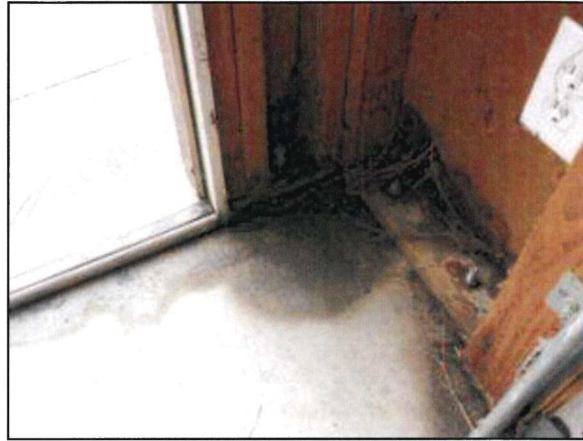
Fire Station #4* A structural post located at the front porch is rotted at the base.
